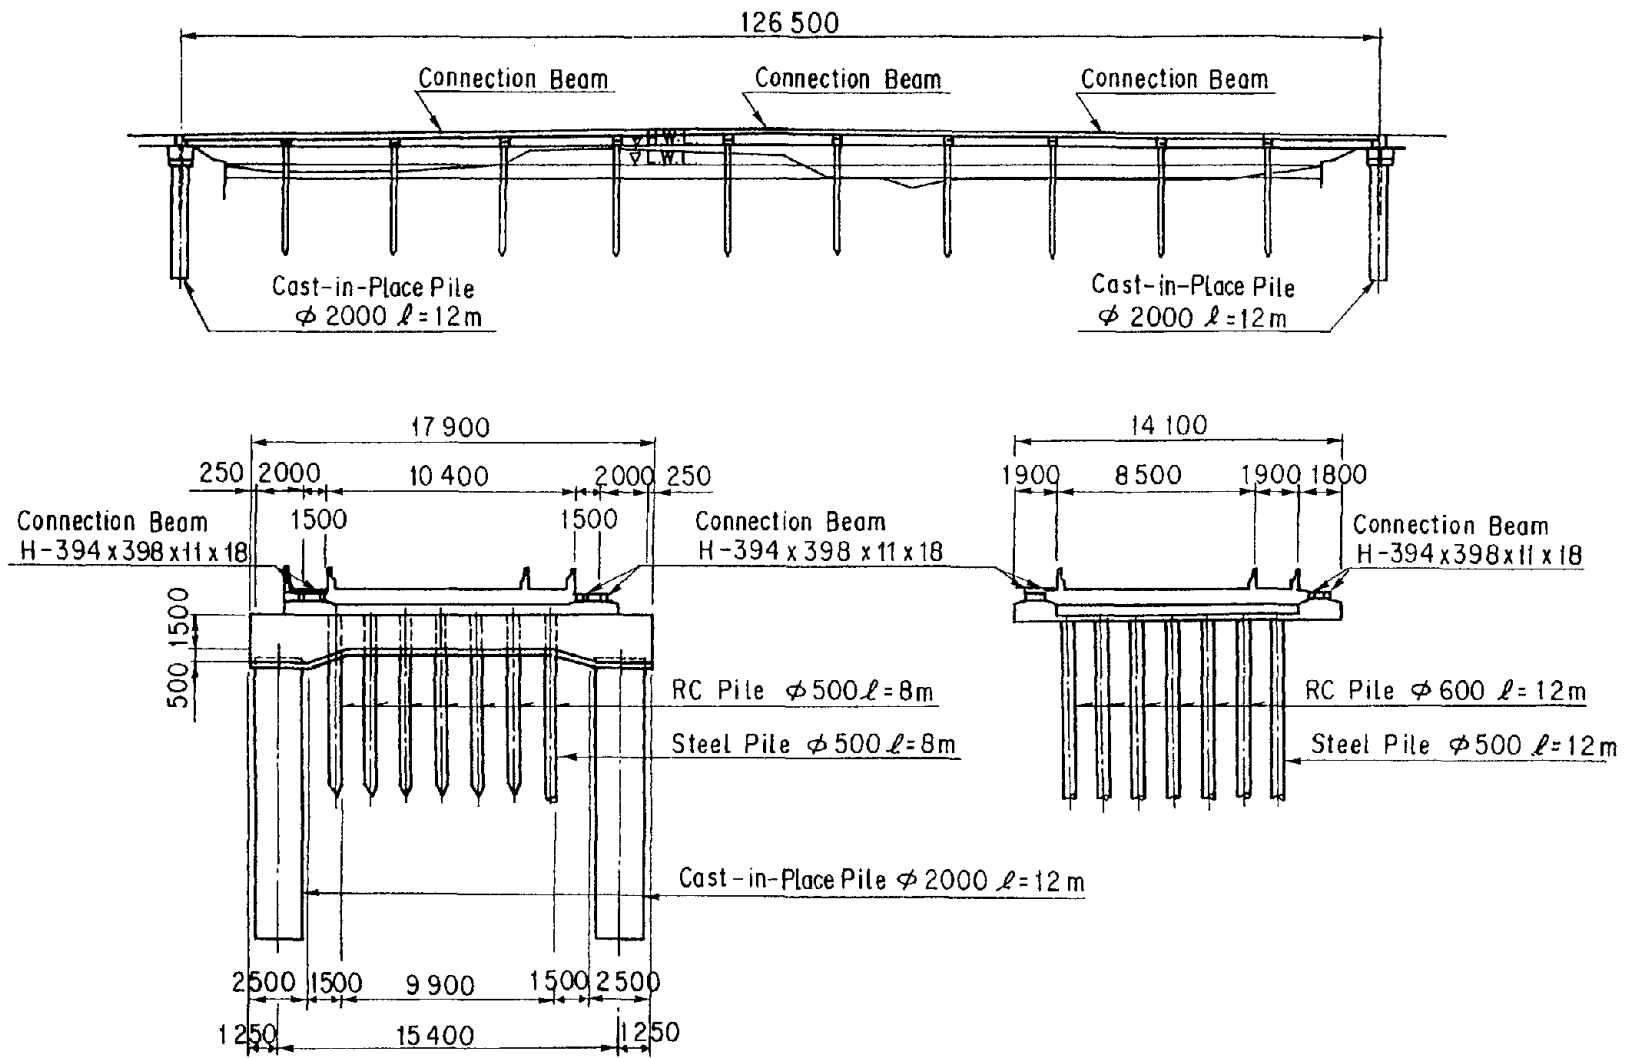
Seismic Strengthening of Bent Piles in Liquefiable Sandy Soils by Connecting Beams
